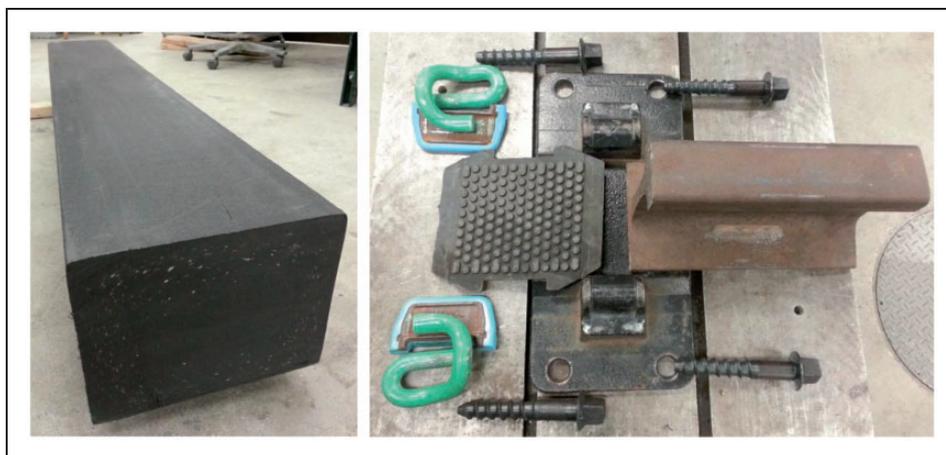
Rail, HDPE composite crosstie, rail section, and fastening system assembly. HDPE: high-density polyethylene.
